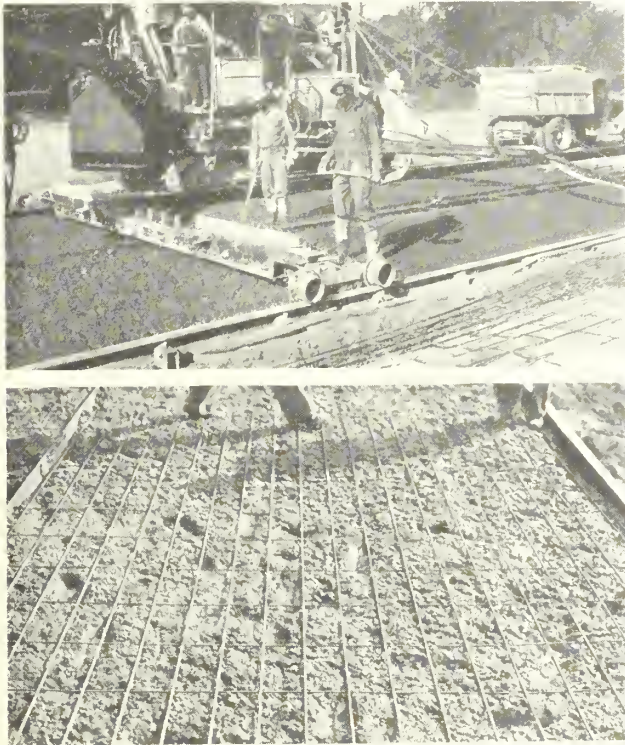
CONSTRUCTION OF SLABS HAVING WELDED FABRIC REINFORCEMENT. UPPER, STRIKING OFF CONCRETE PREPARATORY TO PLACING WELDED FABRIC; LOWER, WELDED FABRIC IN PLACE.
